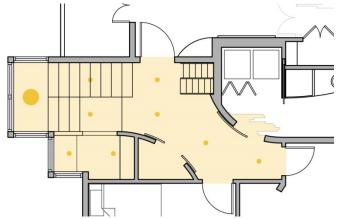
Second Floor Transitional Space - artificial lighting diagram
